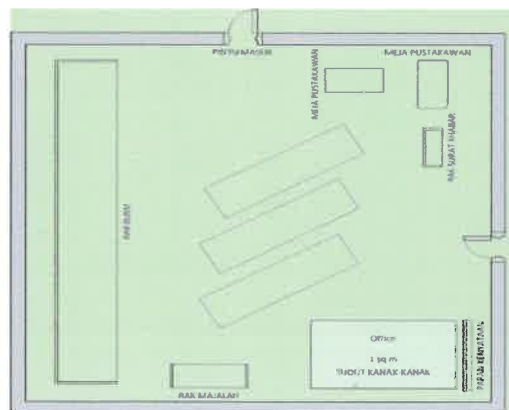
(d): Two-Dimensional (2D) Floor Plan
